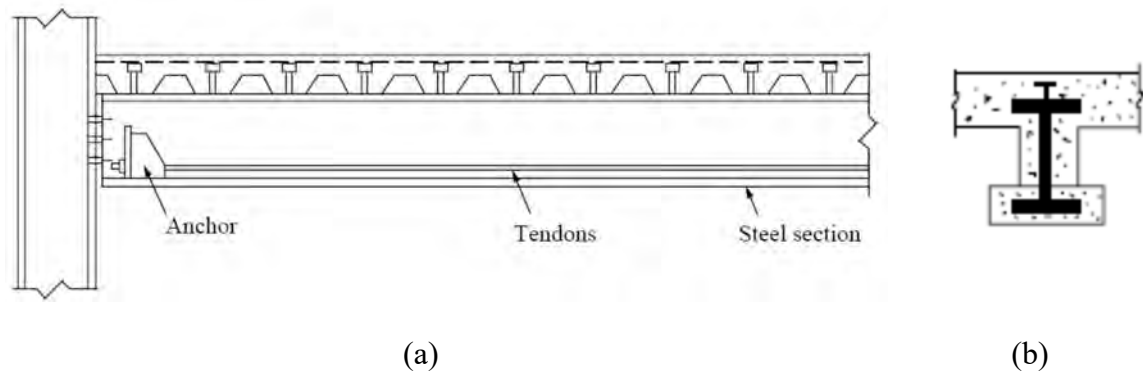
a) Prestressing of composite beam, b) Prestressed Beam (Uy and Liew 2002).
